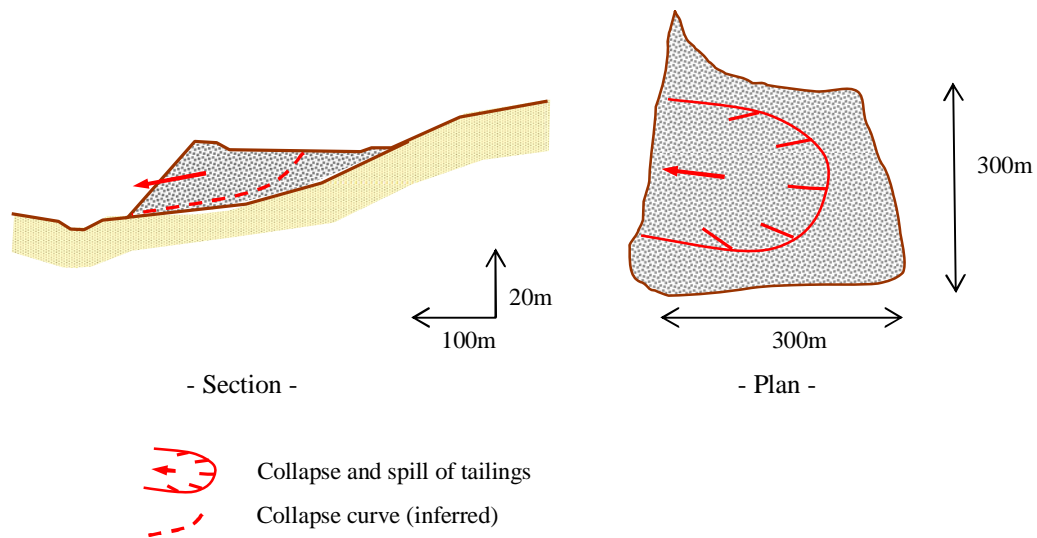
TD-IV Tailings Dam and Collapse of Tailings
